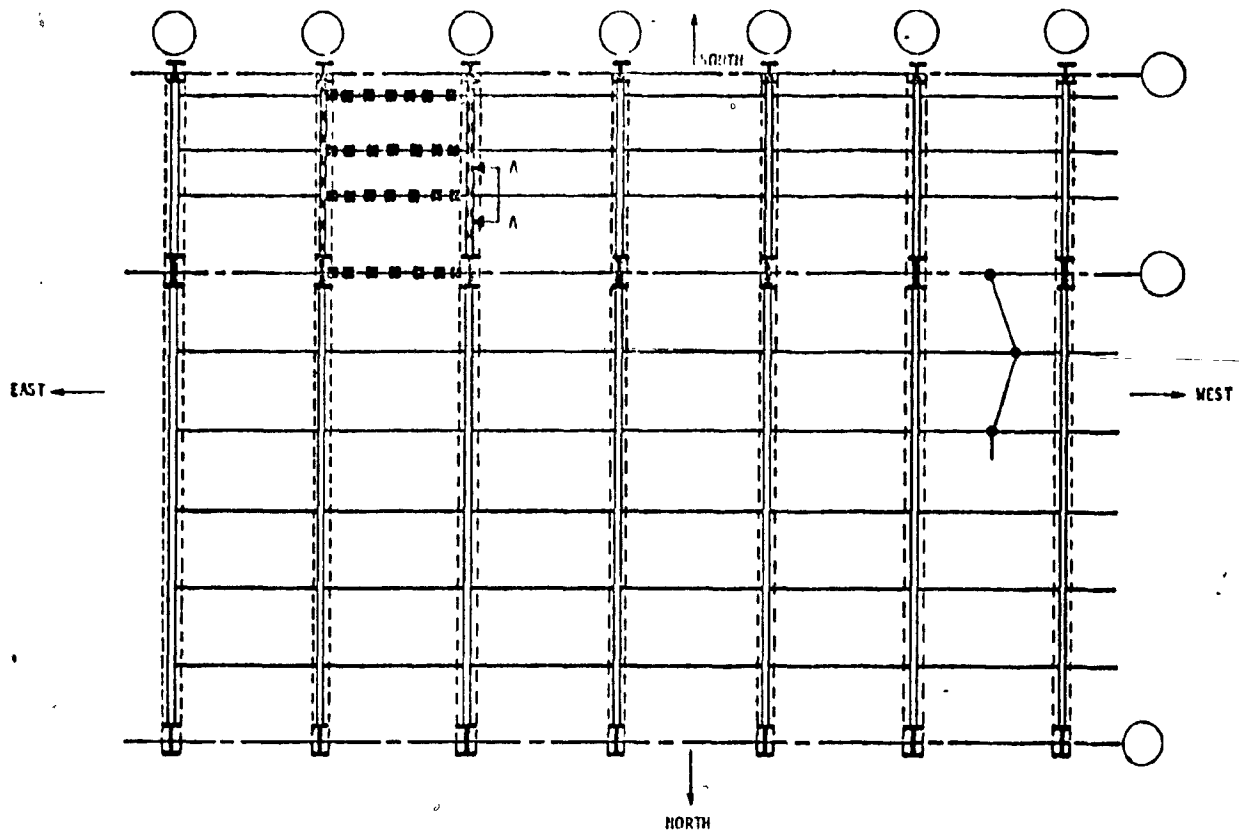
Welding the rib-beam with the main girder.
